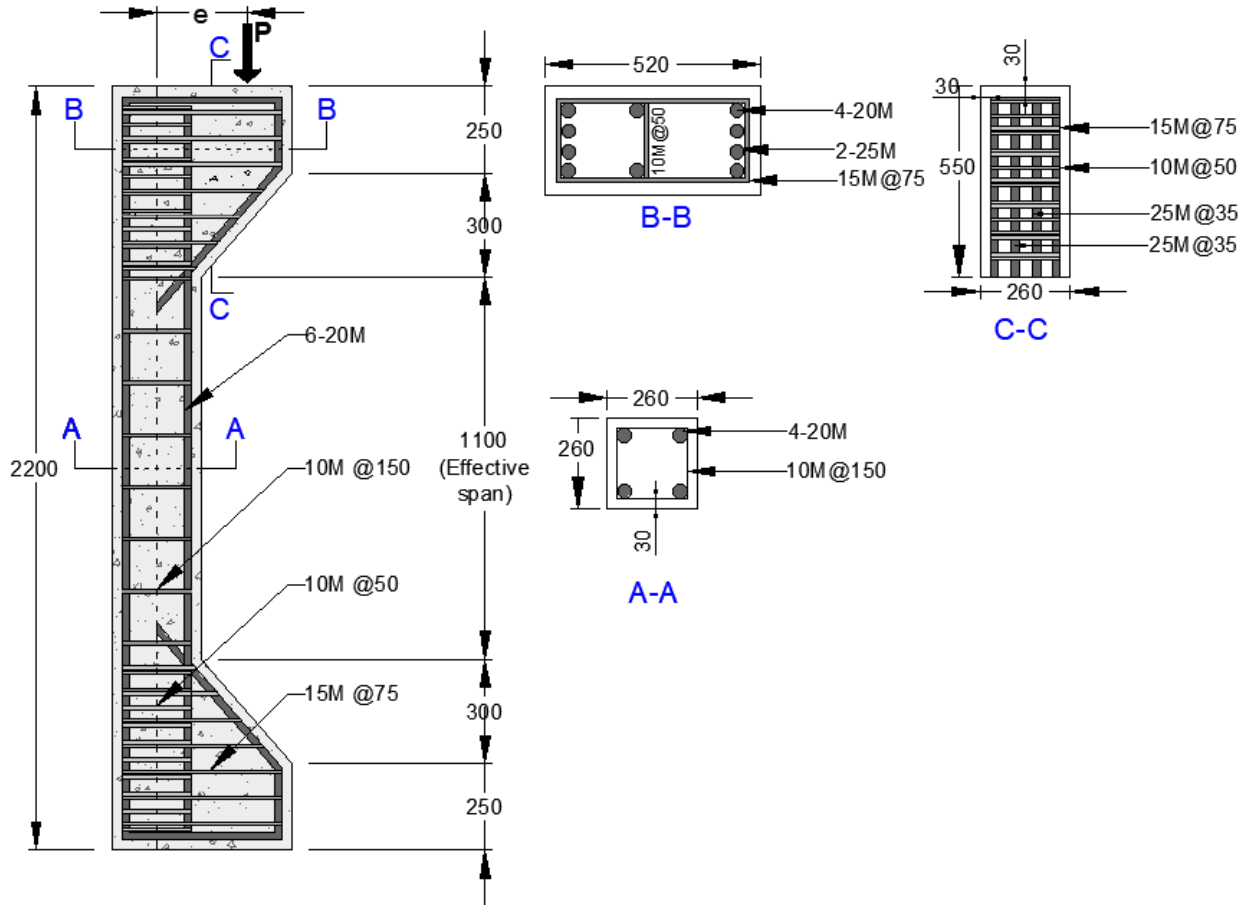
Geometry and reinforcement details of RC column (dimensions in mm)
